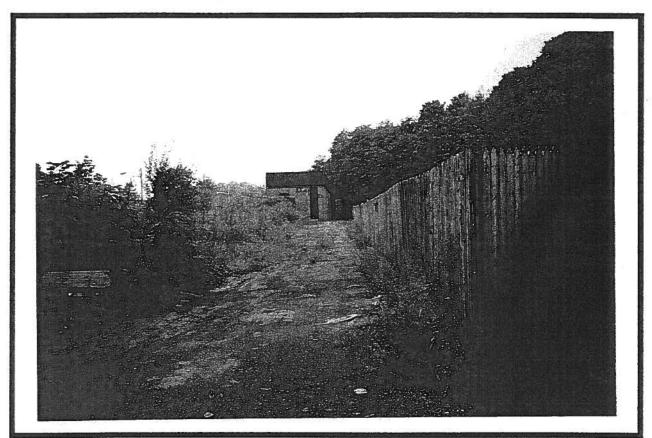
Roadway and Grass Areas Surrounding the Stockade Fenced Area
